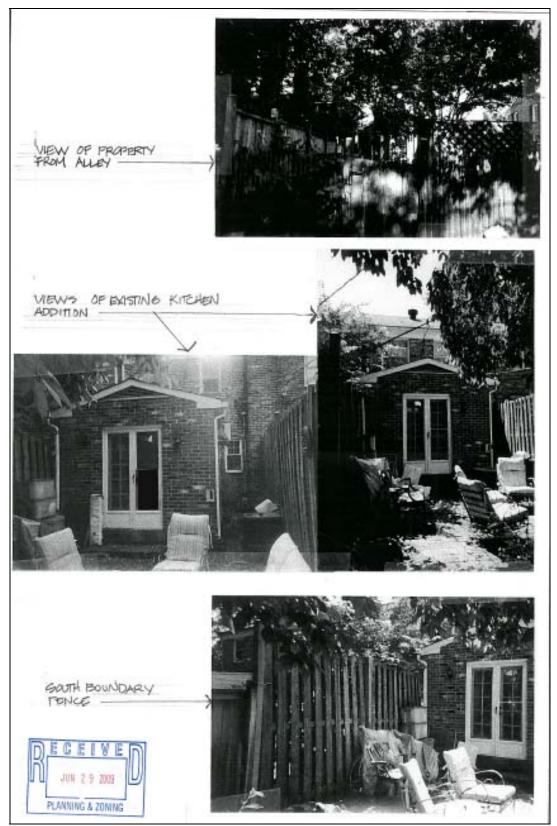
Images of rear (east) elevation. Rear wall of rear addition proposed to be encapsulated.
